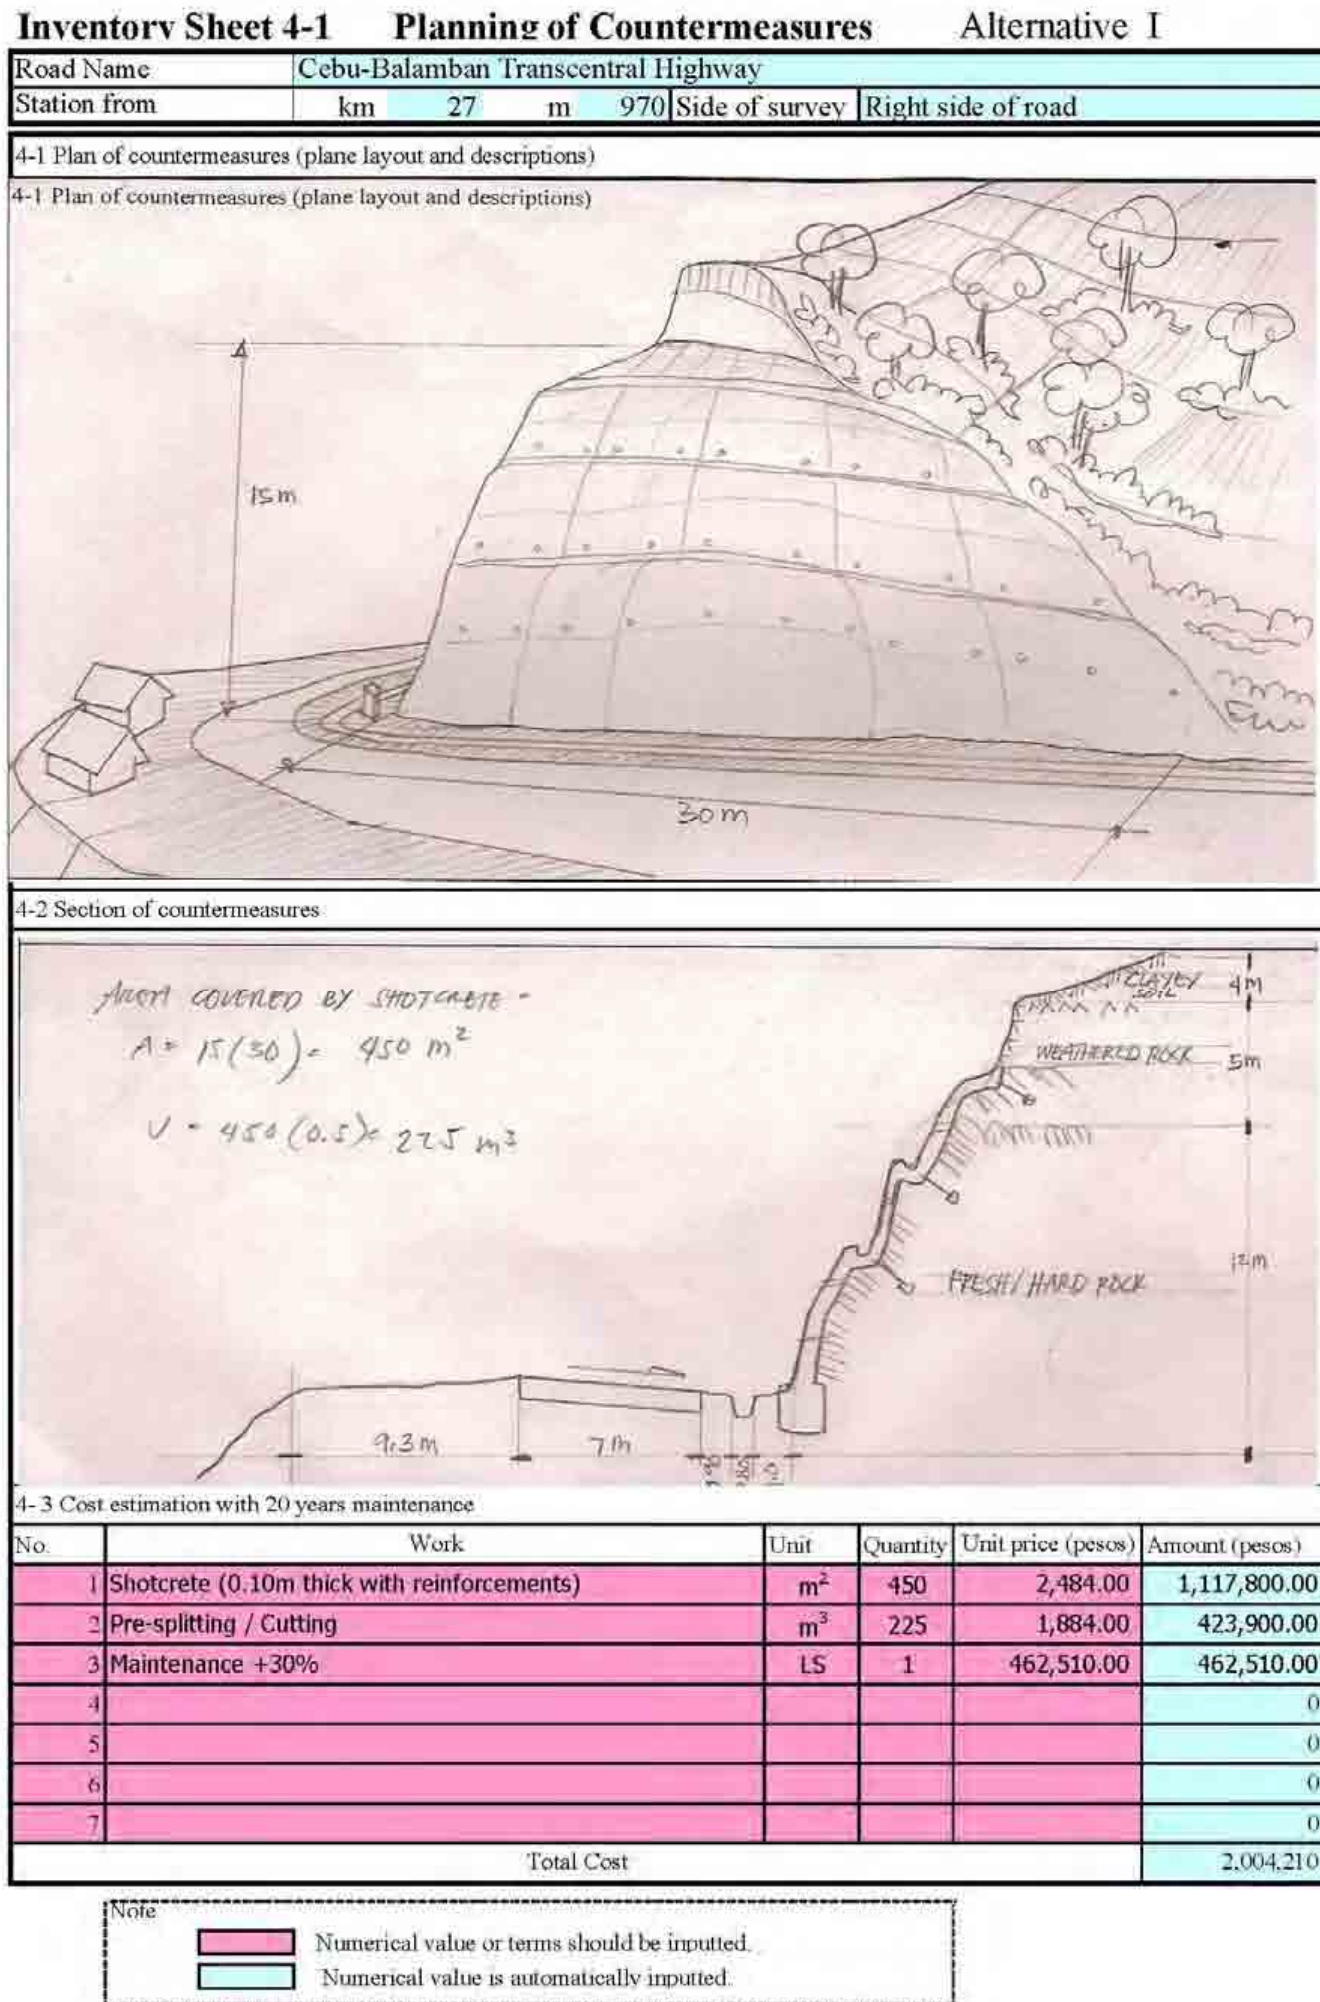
Example of Inventory Sheet 4-1: Planning of Countermeasure Alternative I for Rock Slope Collapse
